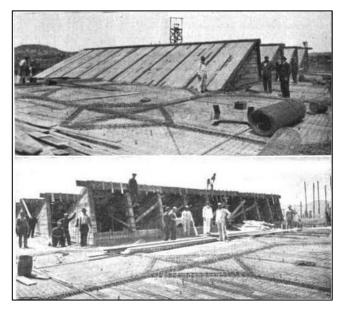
Details of Saw-tooth Roof Monitors during construction, also showing reinforced concrete construction. E. F. Cykler, 1915.
